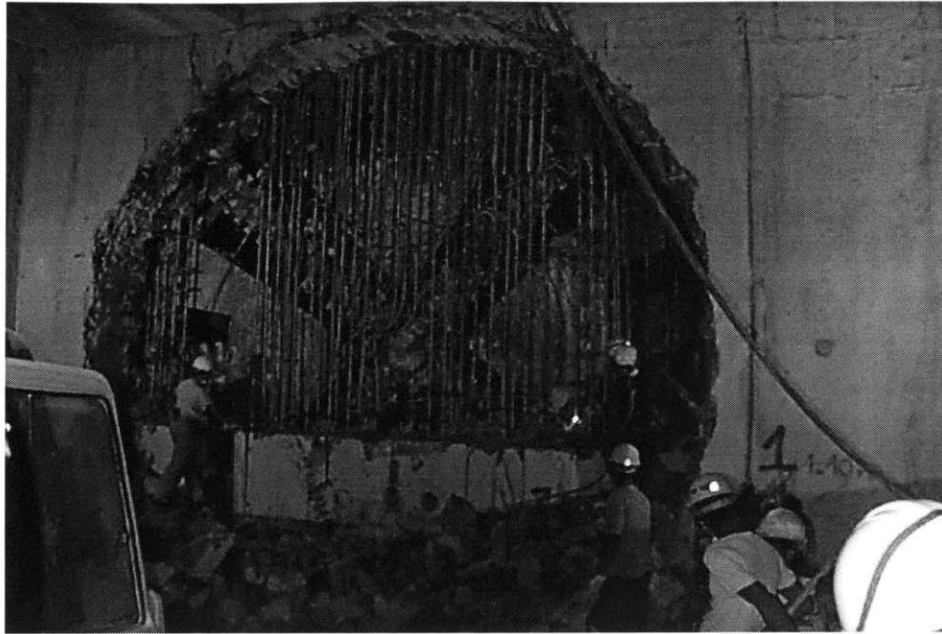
Breakthrough at Lumphini station (South Tunnel Section)
